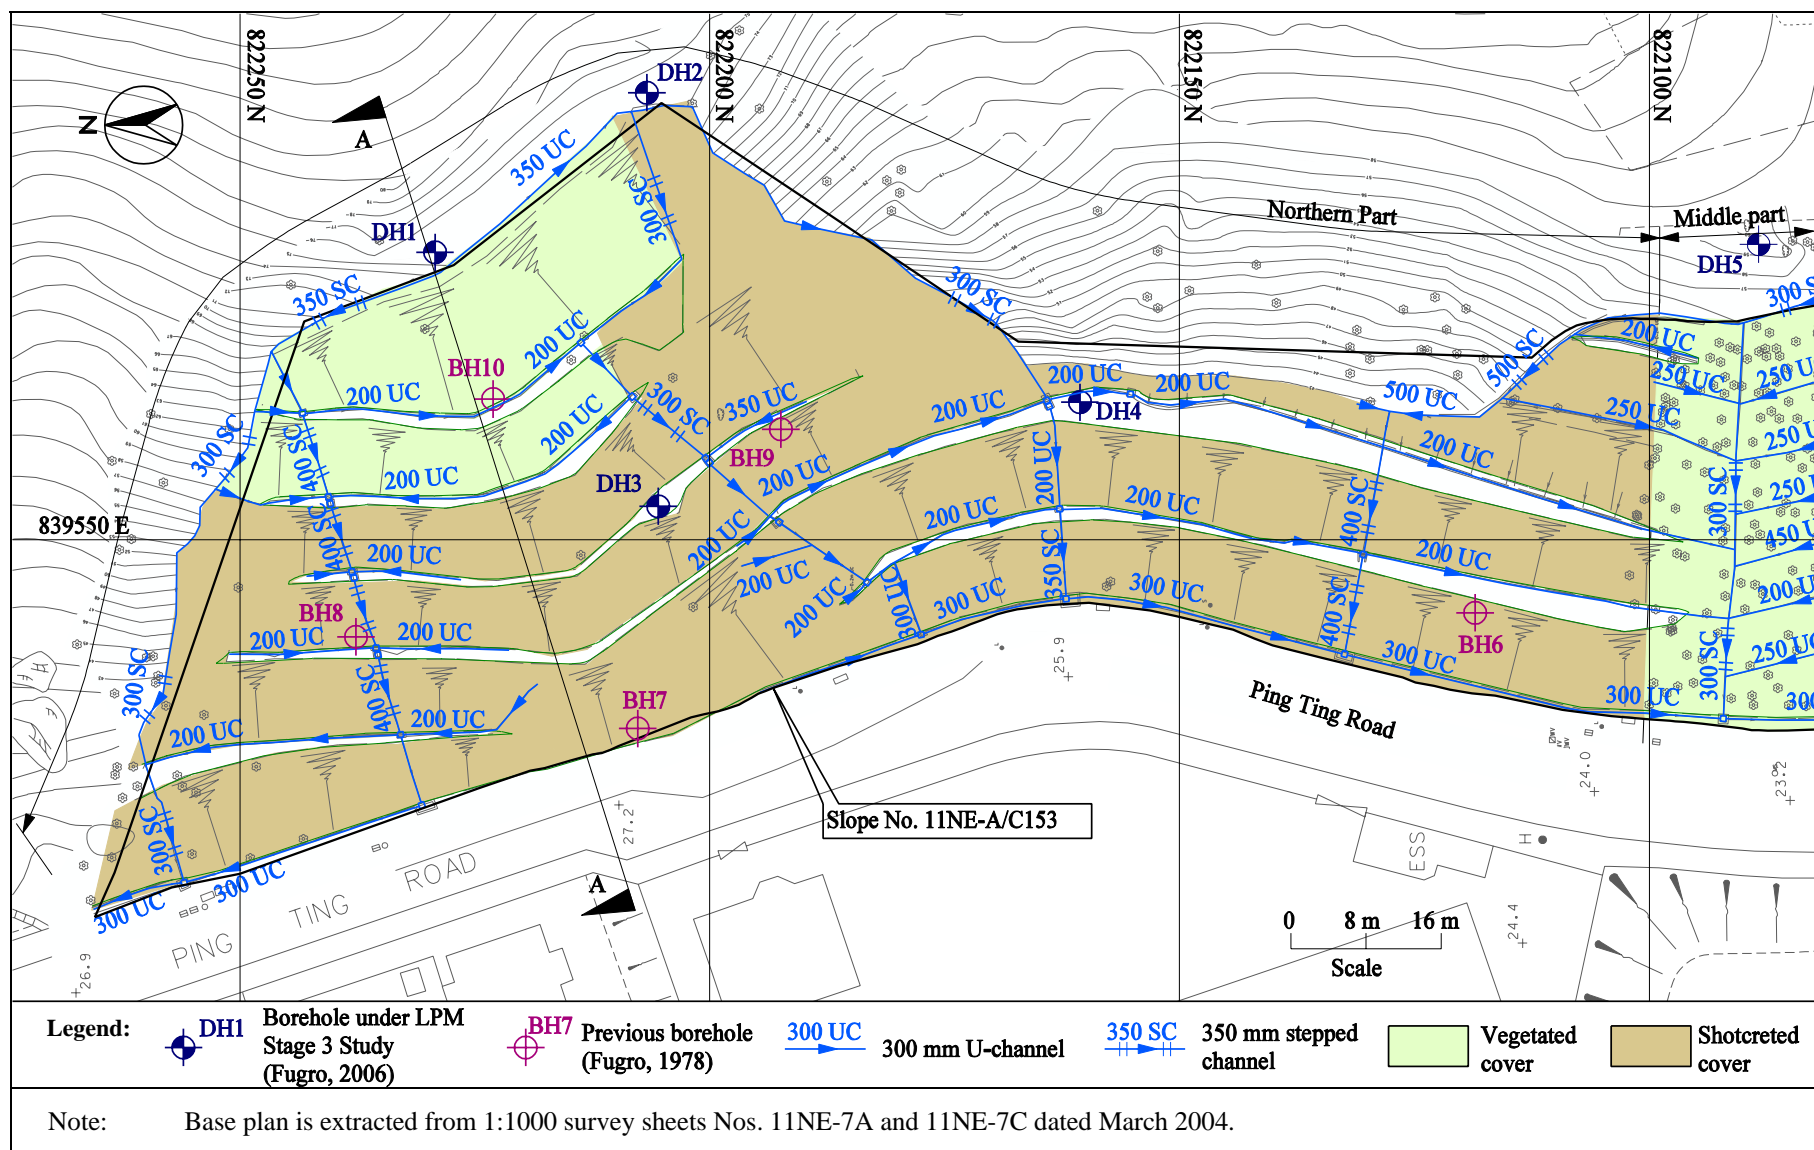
Site Layout Plan (Sheet 1 of 2)
